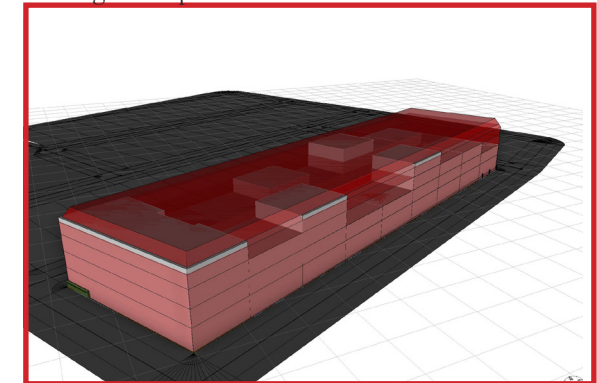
A change in the overall floor height alternates between 2 floors and 4 while staying within the building envelope
